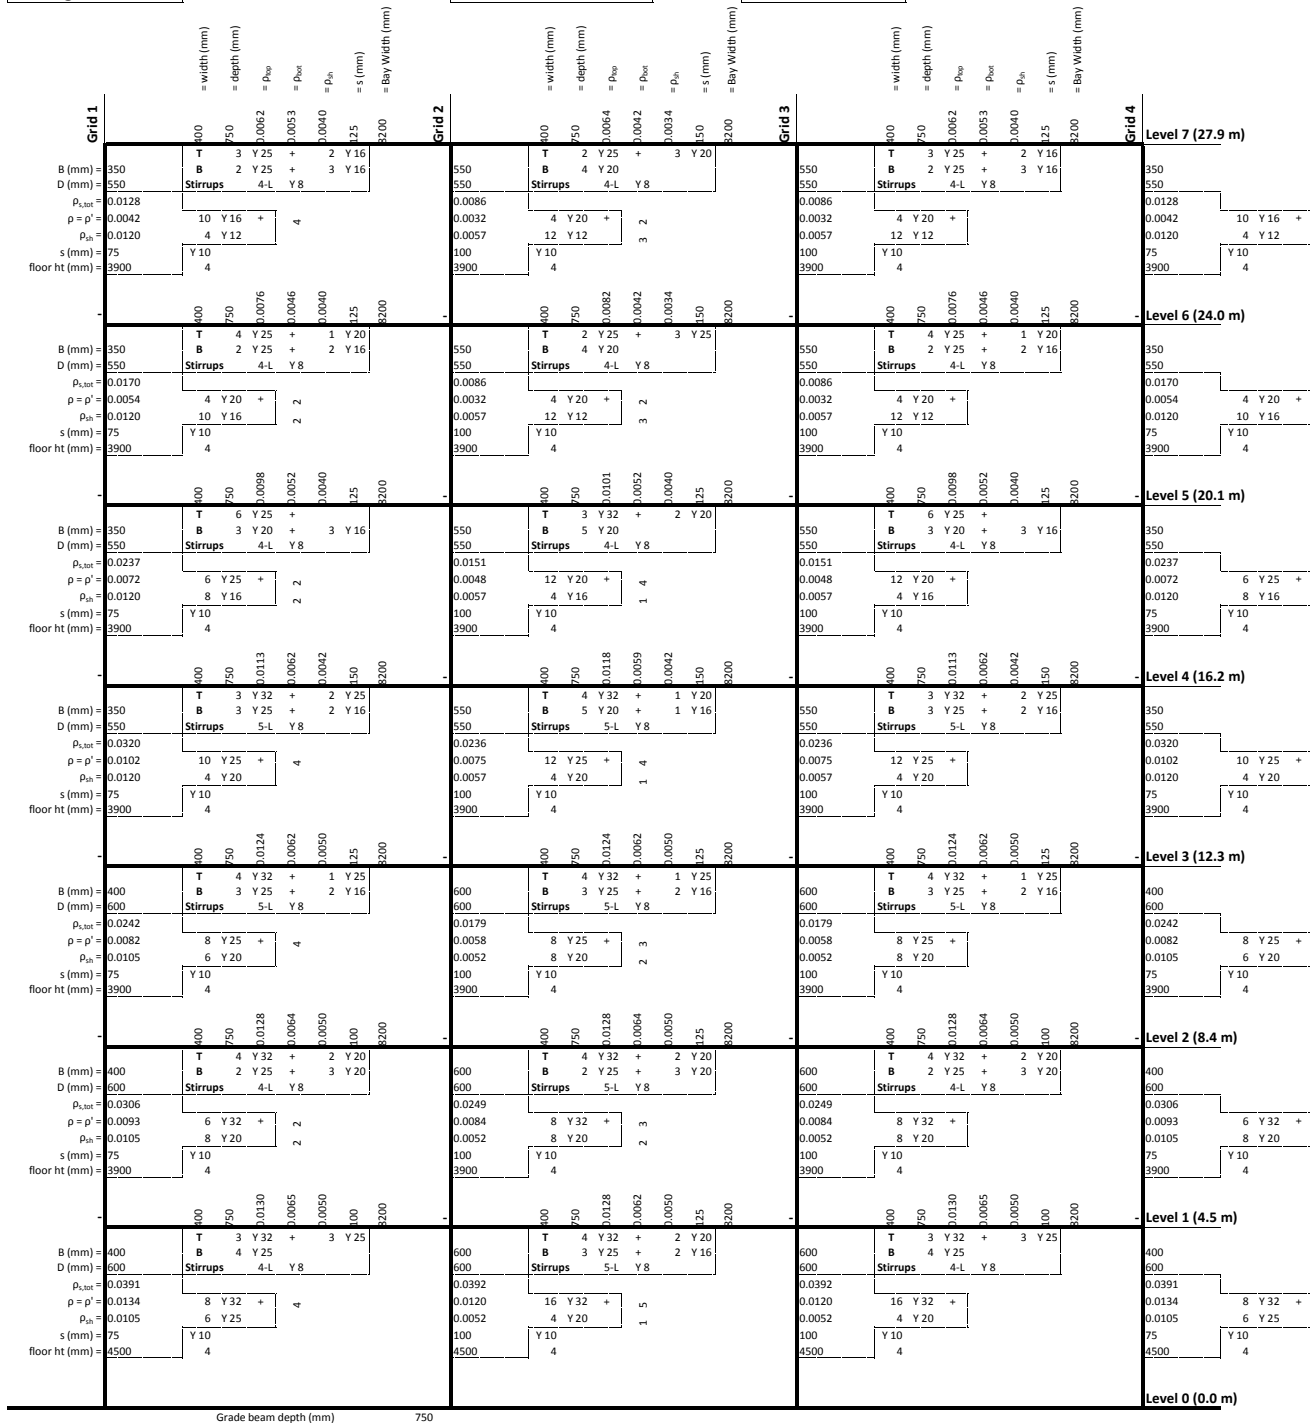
Provided reinforcement and modeling details for building ID 2223
